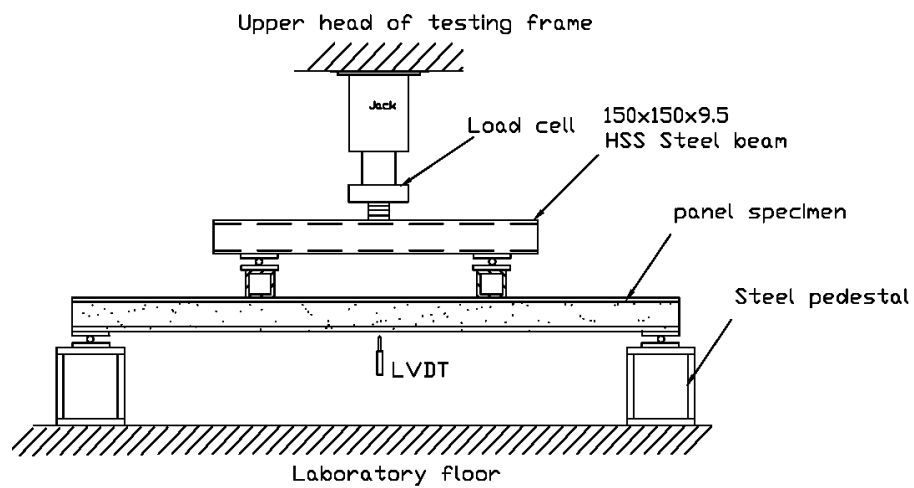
Schematic diagram of the elevation of the test setup for flexural loading test
